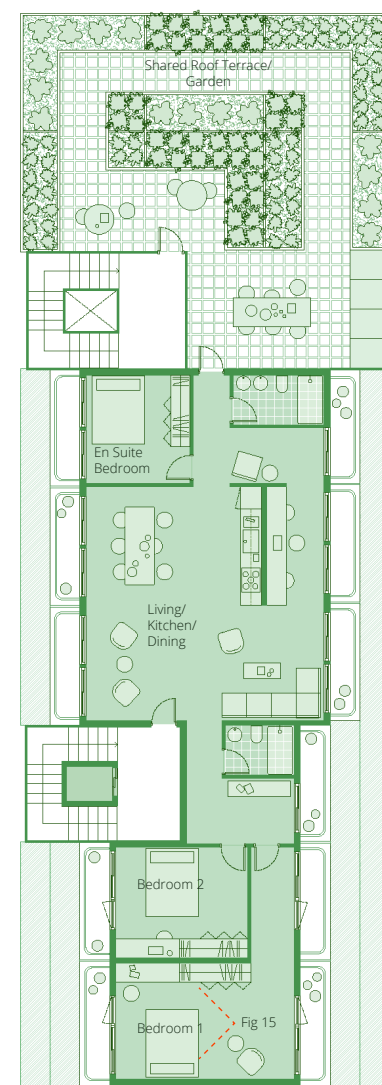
Fifth Floor Plan: Multigenerational Family Floor
